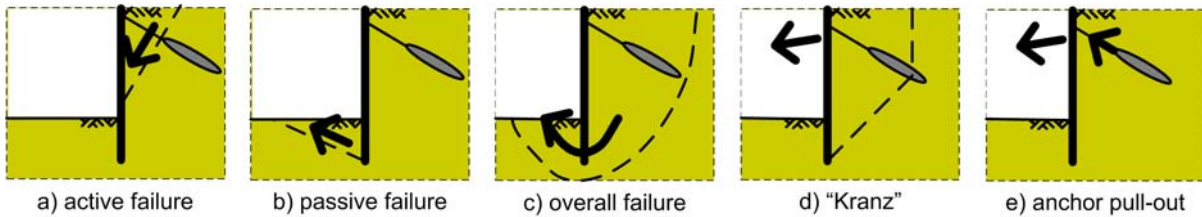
Failure Mechanisms in the Soil For Anchored Retaining Walls
